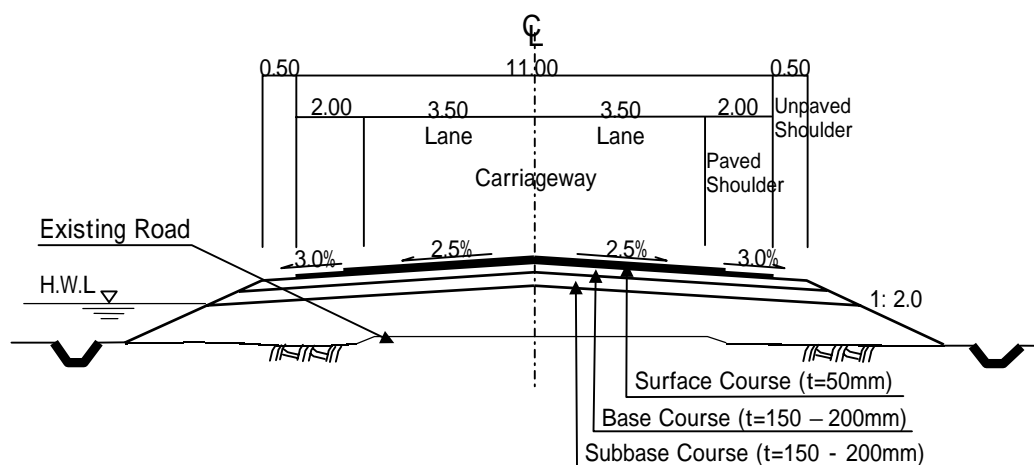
Typical Cross Section for Populated Section (Flat Area)
